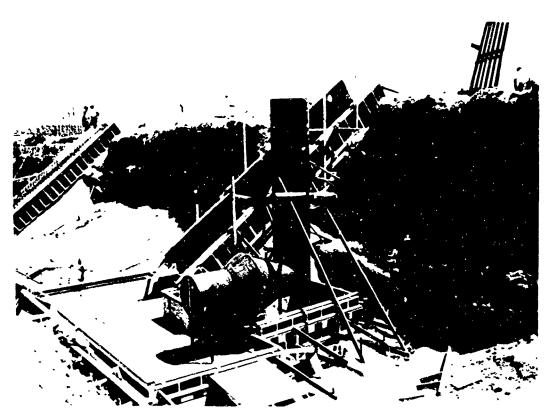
Structure II-4, base slab formwork with ventilation pipe in place (May 27, 1957).
